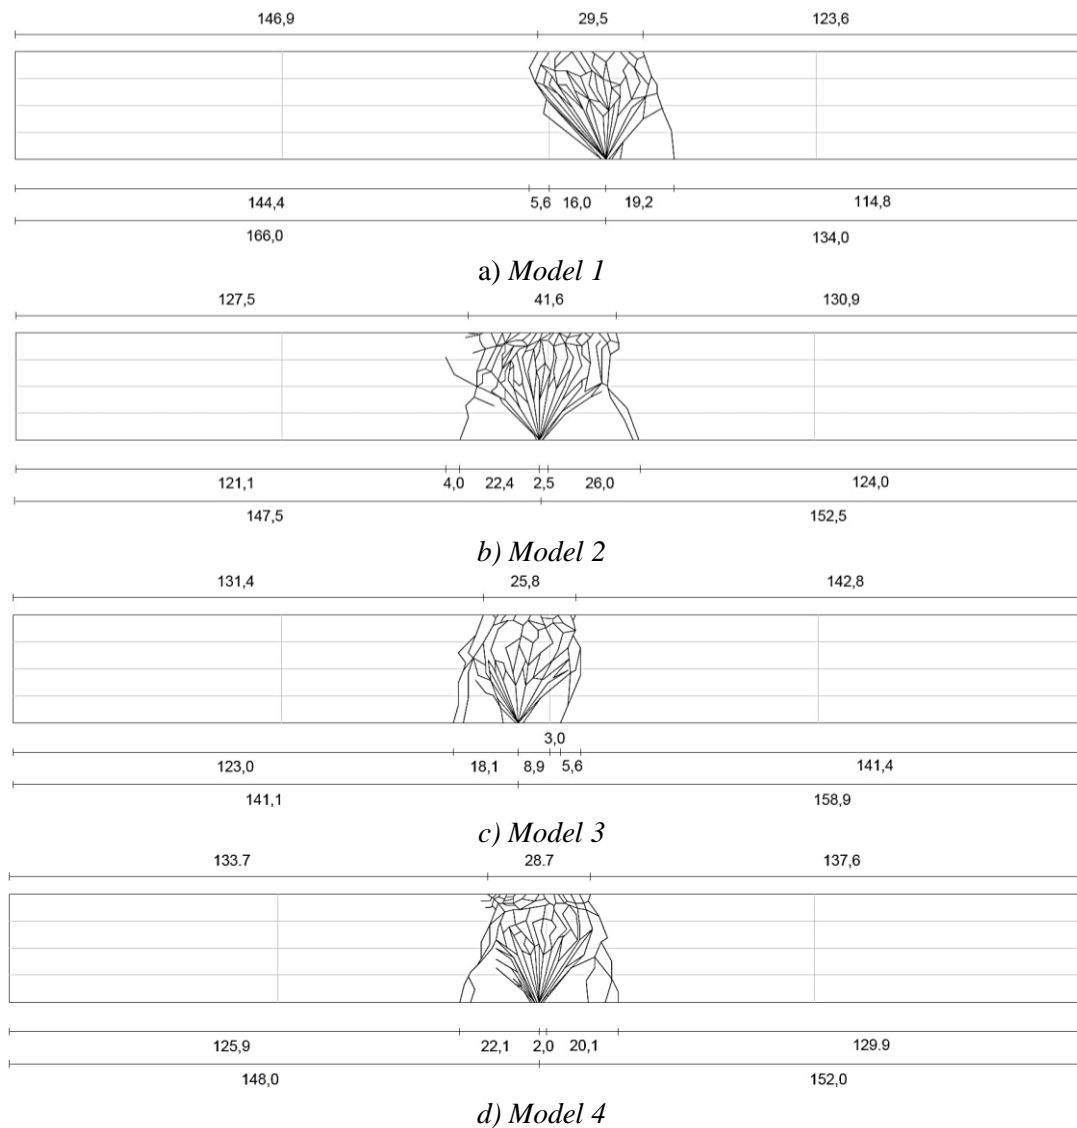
Schematic representation of the final fractures (dimensions in millimeters).
